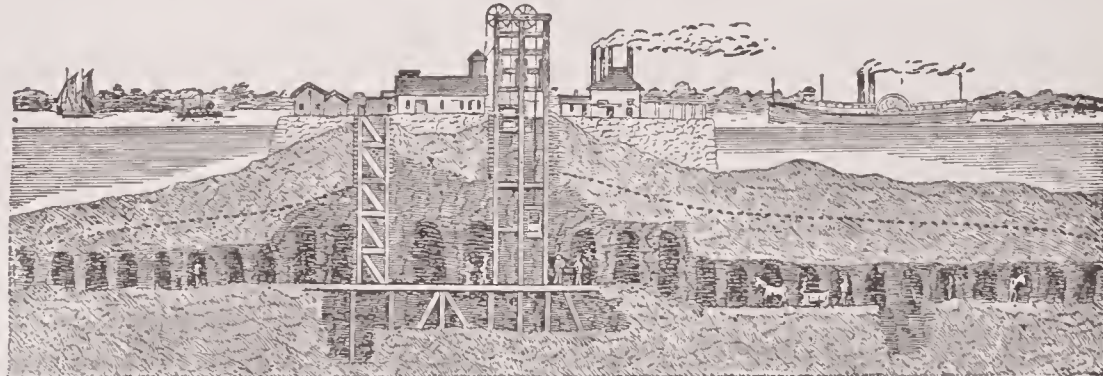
SUBMARINE EXCAVATION OF FLOOD ROCK REEF.
